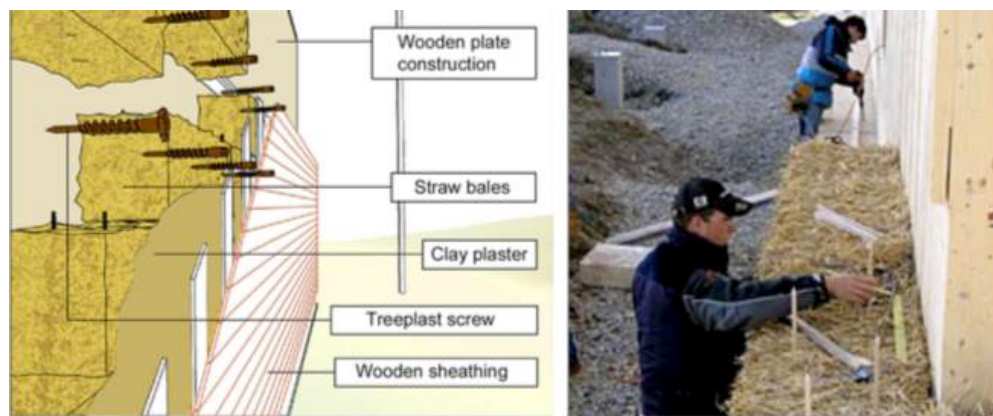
The wall of the S-House showing the layers of the straw bale insulated novel construction in a model and on the building site (adapted from Wimmer, Hohensinner, & Drack (2004)).
